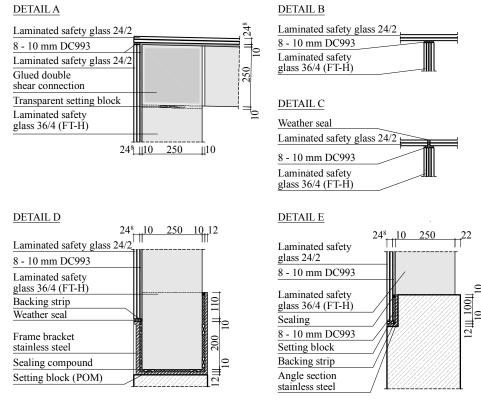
Details - frame corner (A), connection of vertical glazing and frame (B), connection of horizontal glazing and frame (C), base mount (D), connection of vertical glazing and concrete trough (E).
